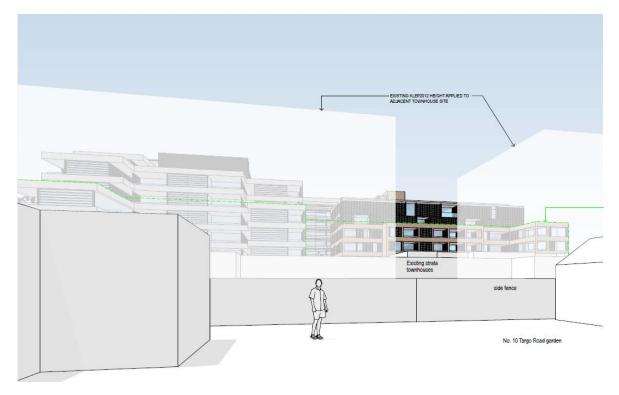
View from No. 10 Targo Road Private Outdoor Space
